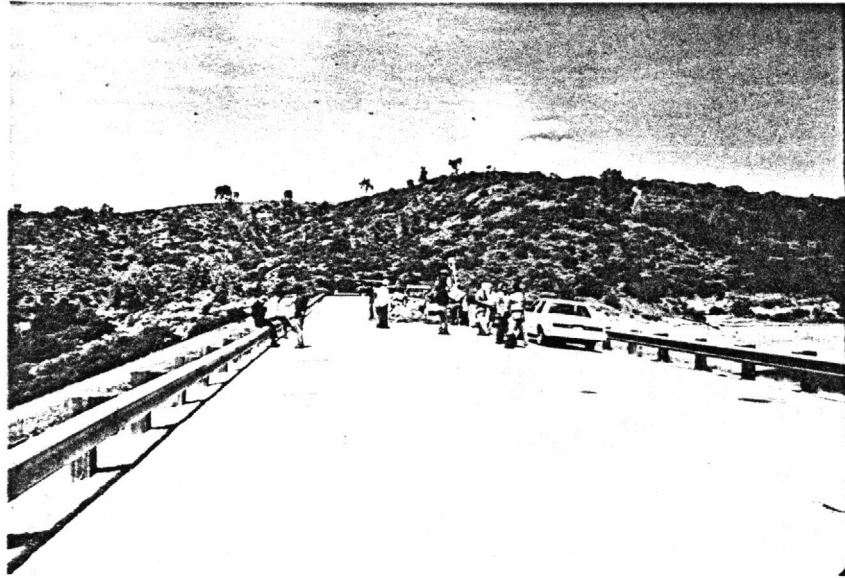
Longitudinal cracks that developed along the crest of the Anderson Dam (location (51)). The location of trench parallel to the longitudinal upstream crack is in the right center.
